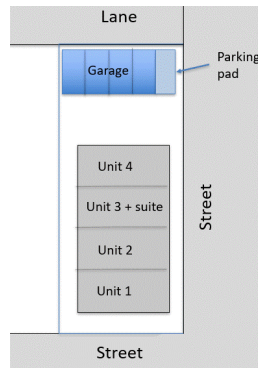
Corner – 1 stalls/unit or suite. Not to scale.
